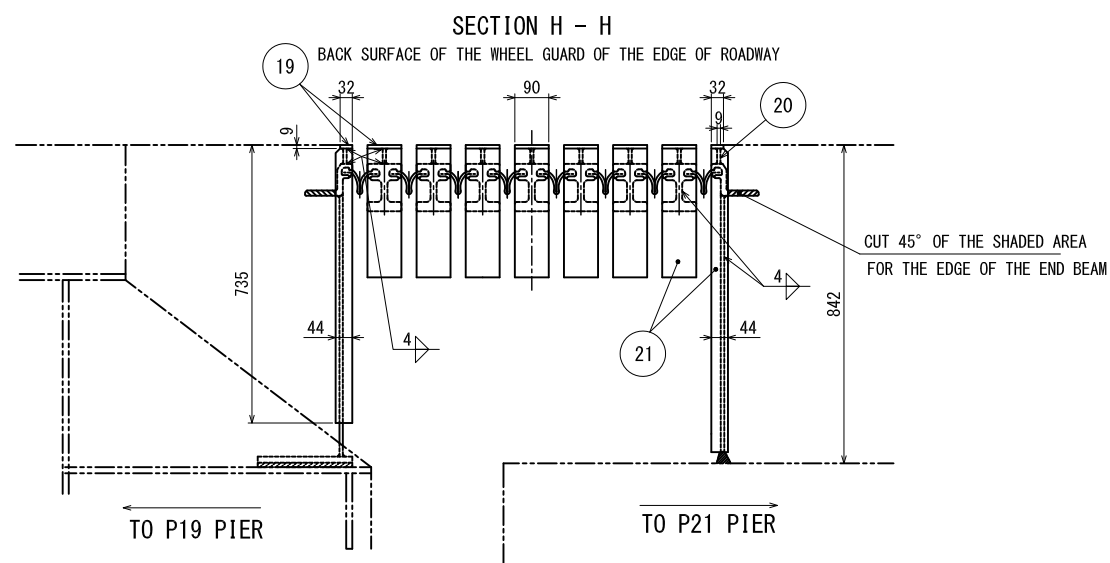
# DETAIL OF EXPANSION JOINT (P20) (4) S=1:20
